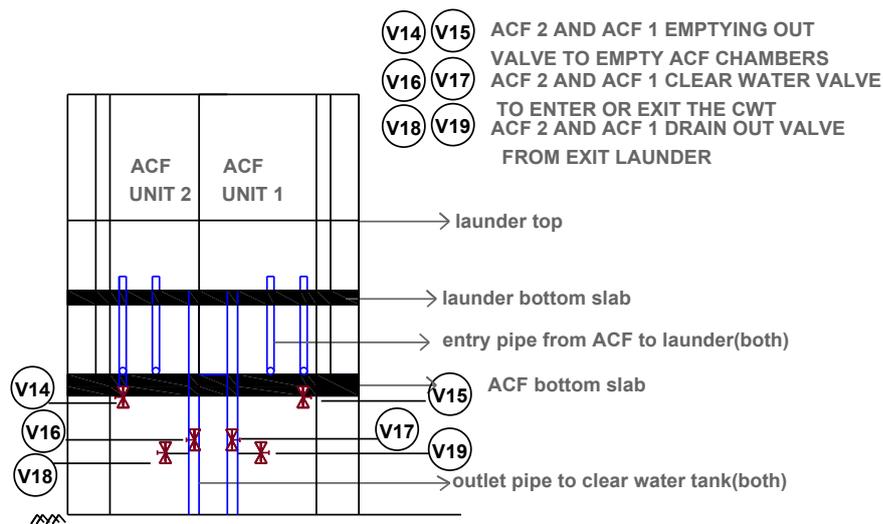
Section drawing of ACF indicating inlet pipes and section of HRF showing perforated collection pipes and vertical cross-flush pipes
